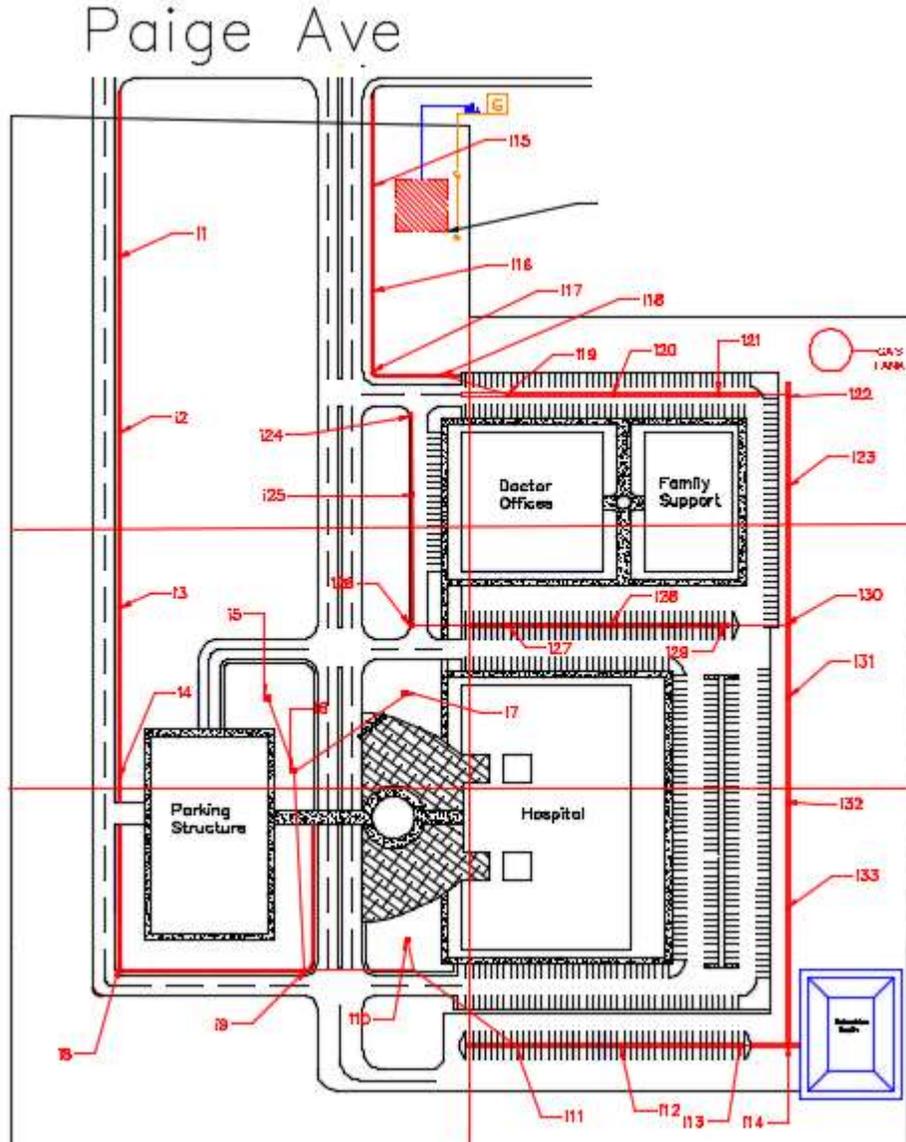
Location of Planned Storm Sewer Pipes and Detention Pond
